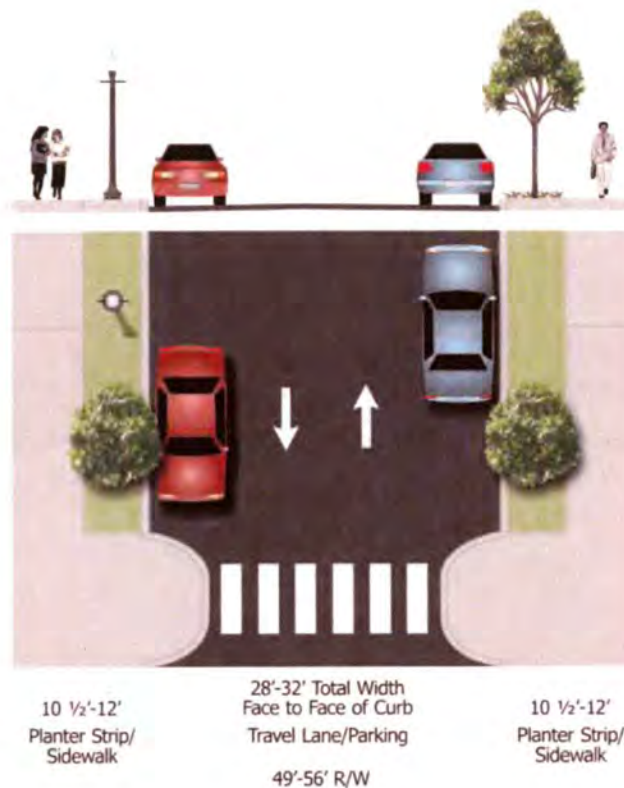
COLLECTOR CROSS-SECTION
